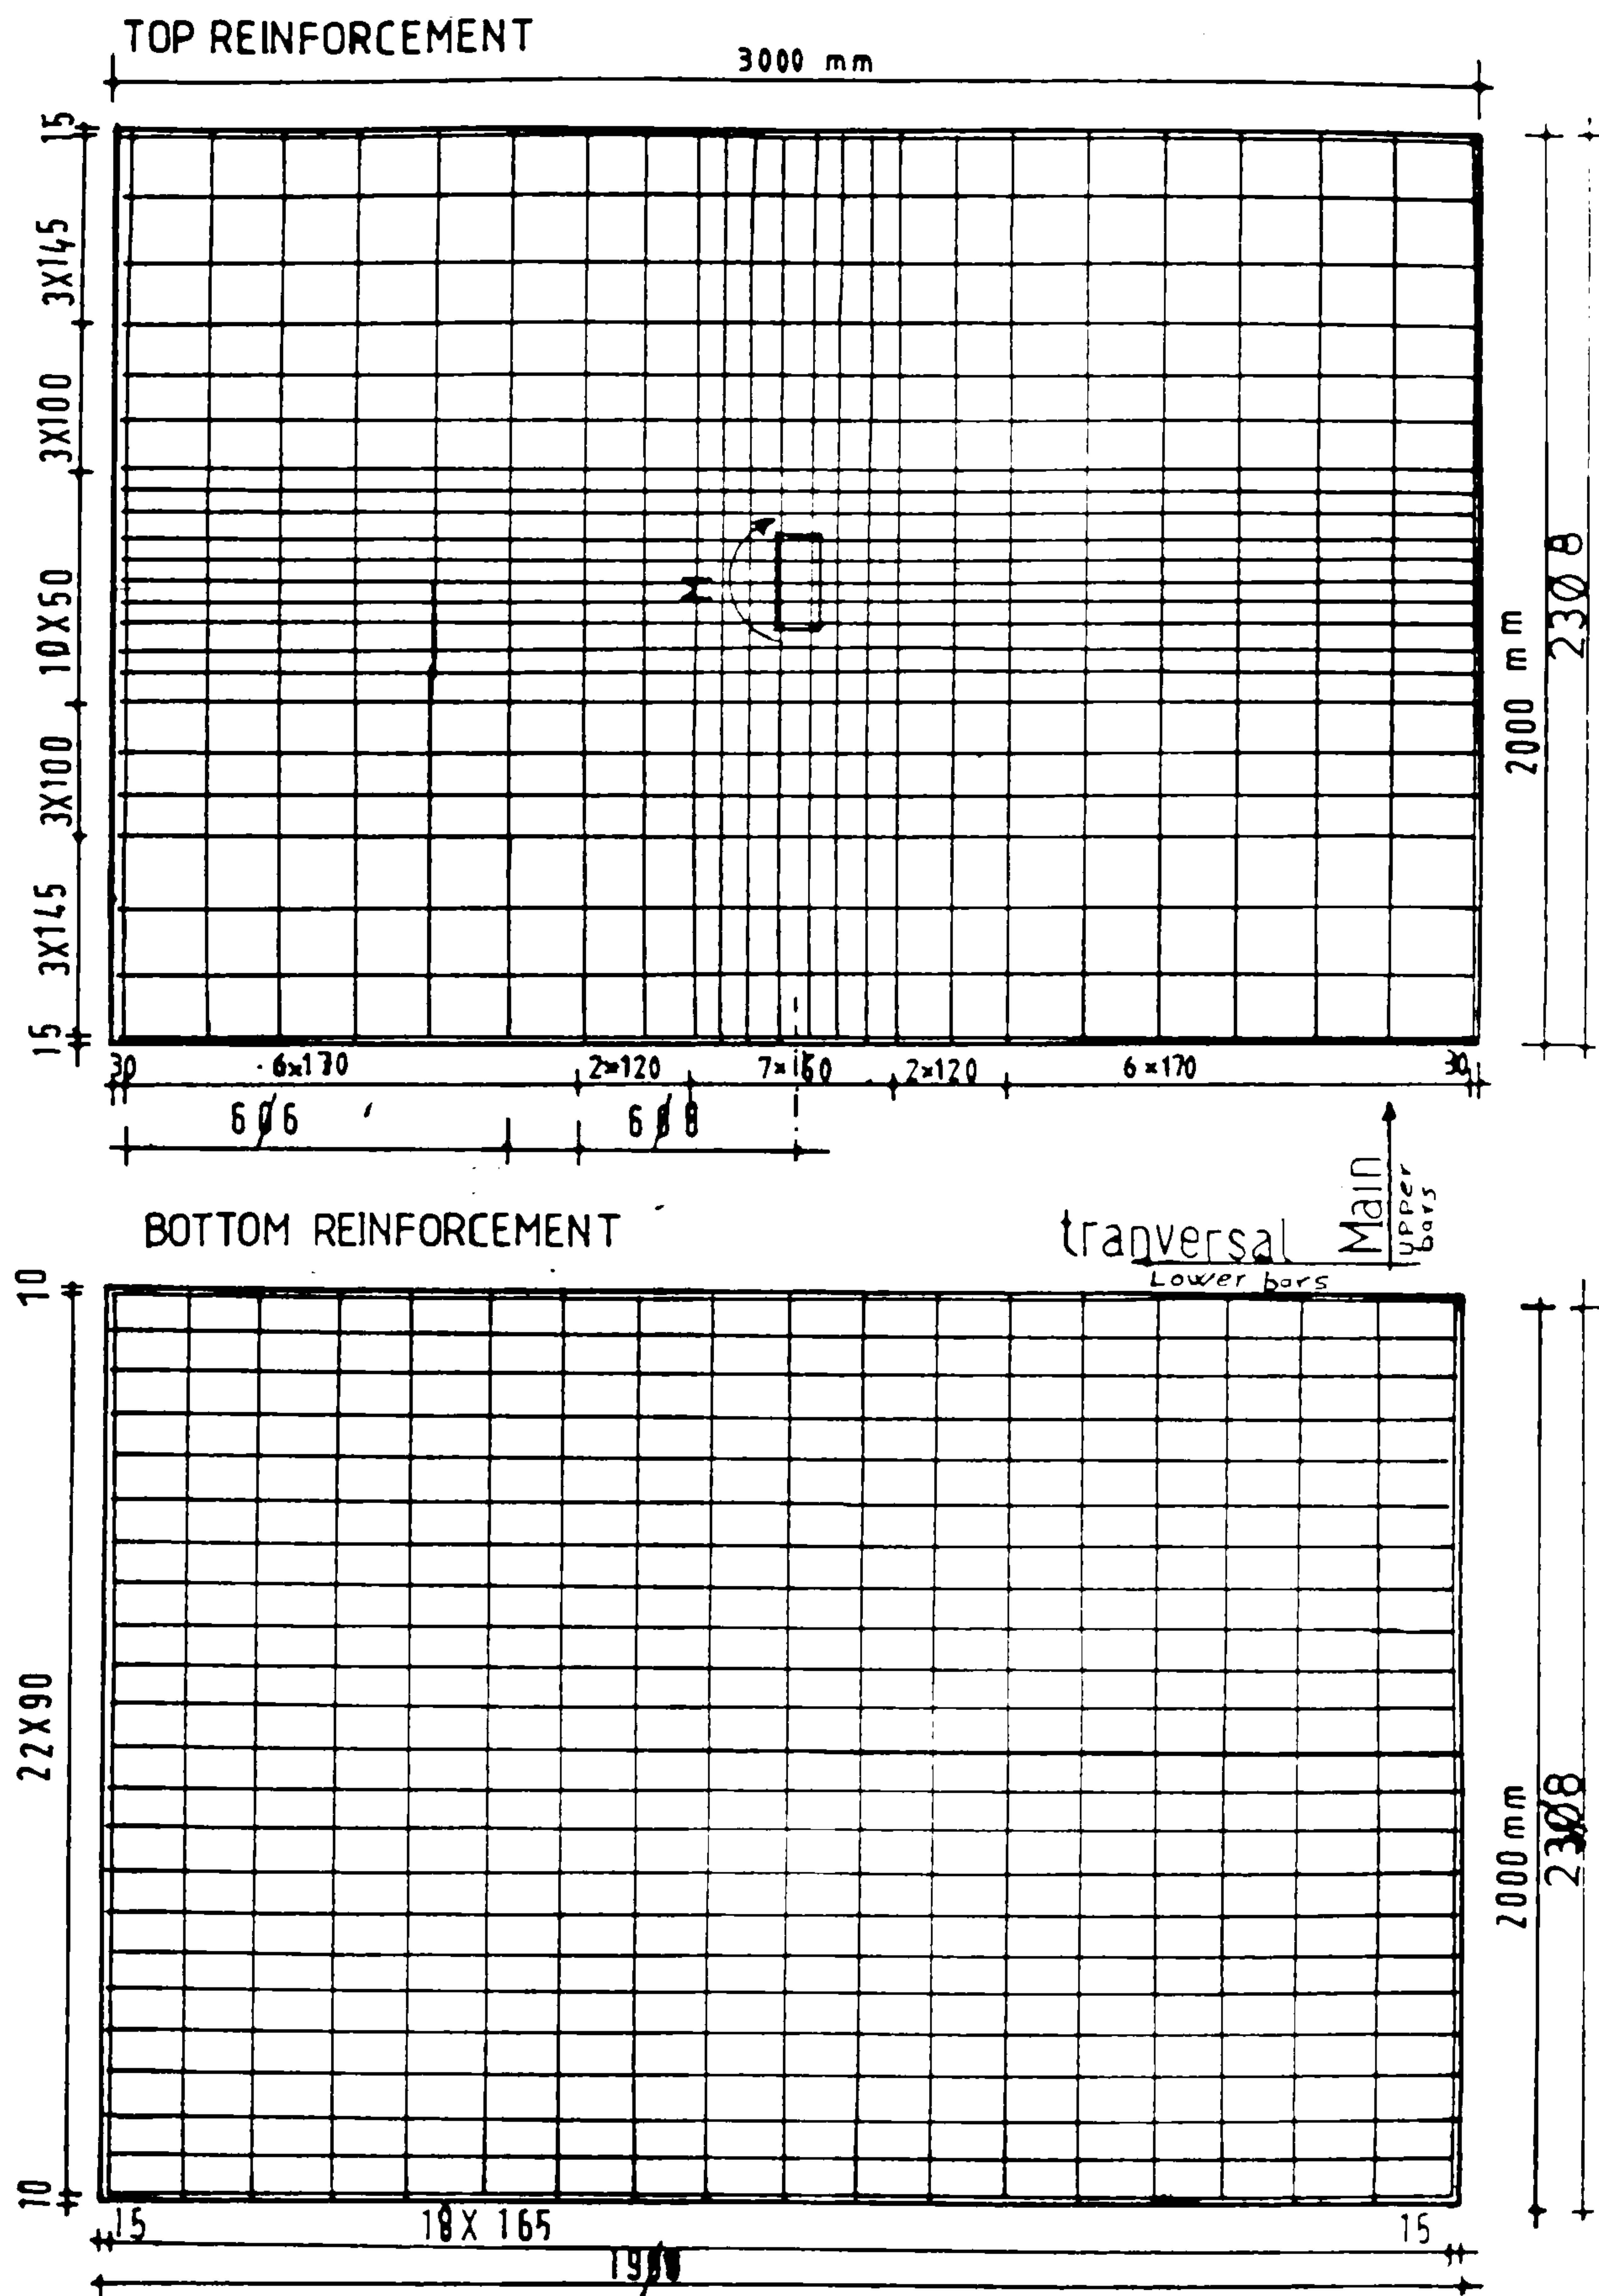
Reinforcement details for slabs SC1,SC2,SD1,SD2
